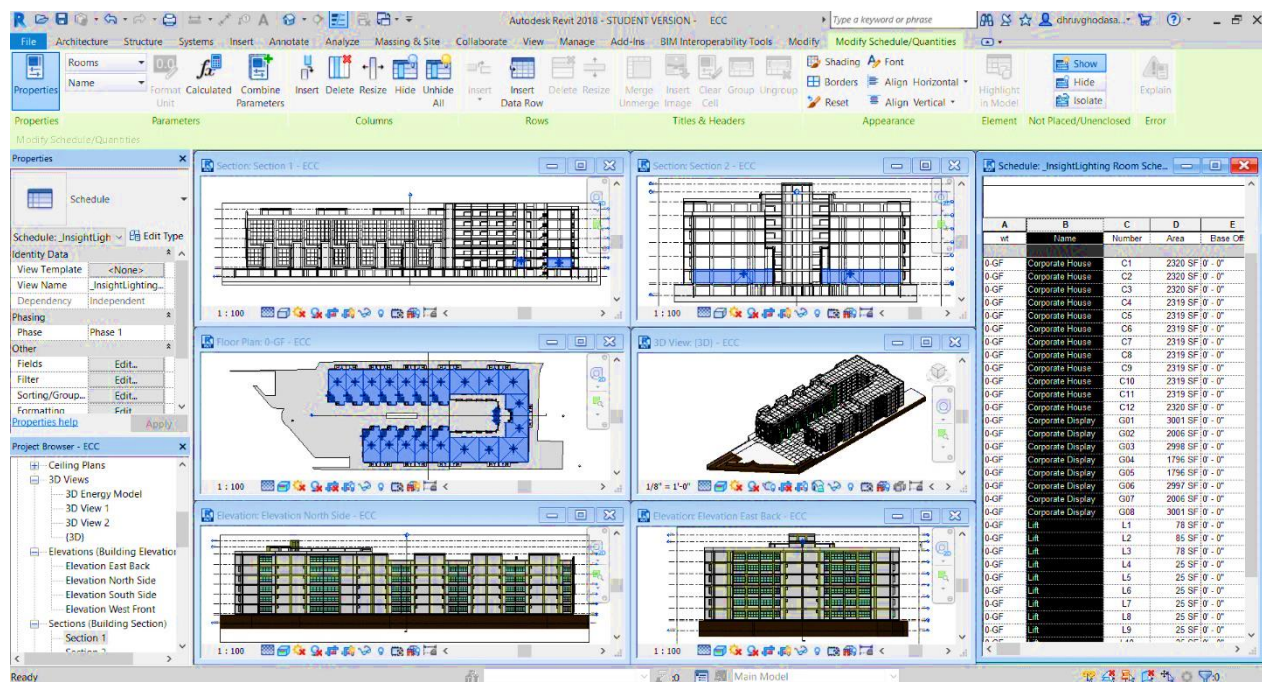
Working with BIM as the integration of sectional details, floor plans, elevations and schedules
